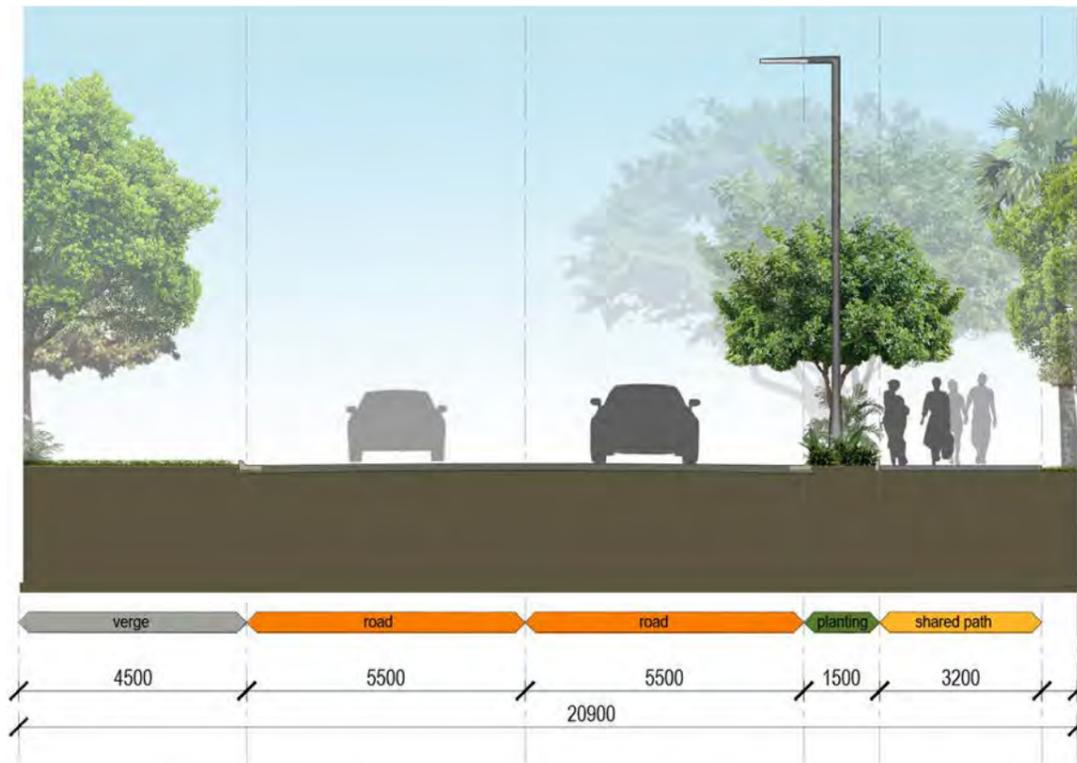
MCGREGOR ROAD PROPOSED ROAD SECTION
